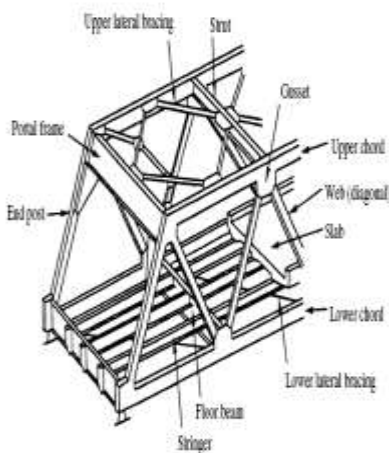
STRUCTURAL LAYOUT OF A TRUSS BRIDGE
